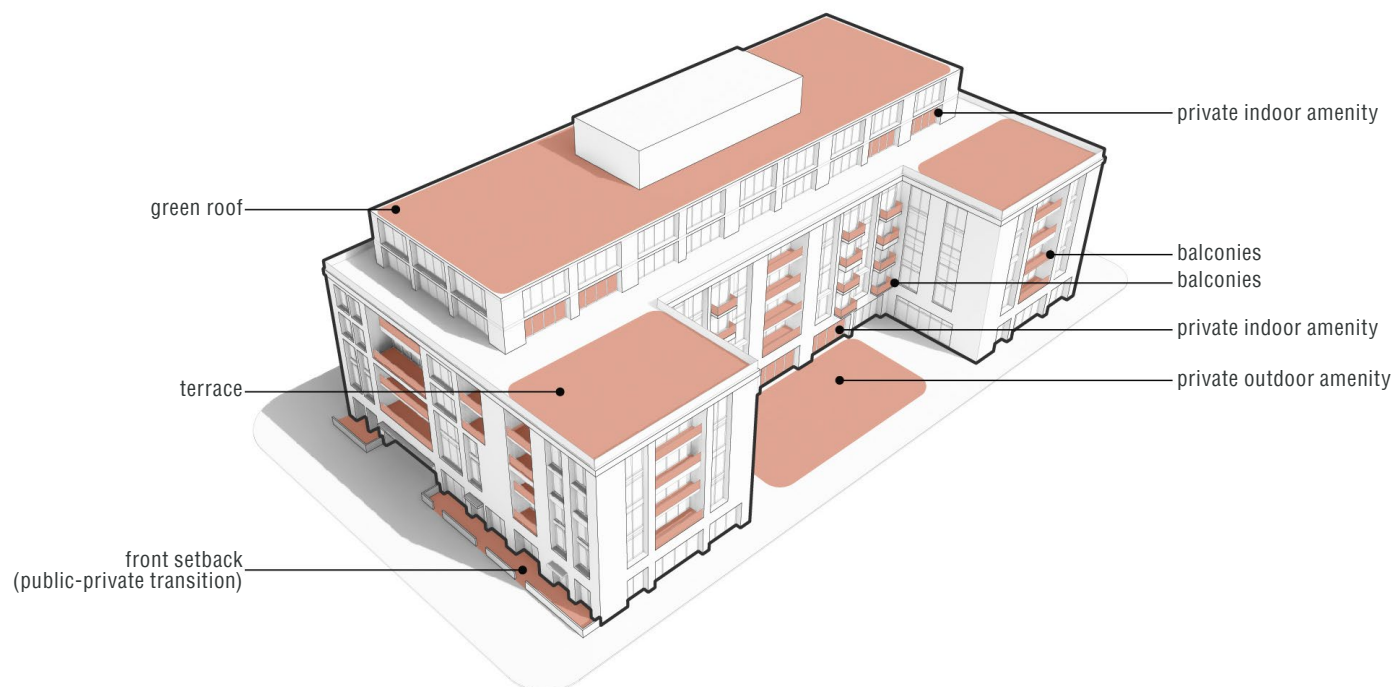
Illustration of private and shared amenity space opportunities throughout a mid-rise building site.
